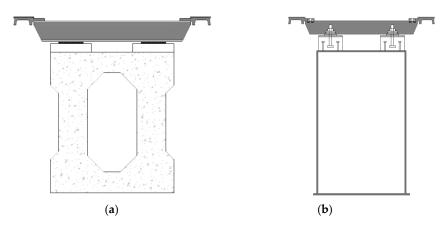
Cross-sections of the tested (a) concrete beam, and (b) steel beam.
